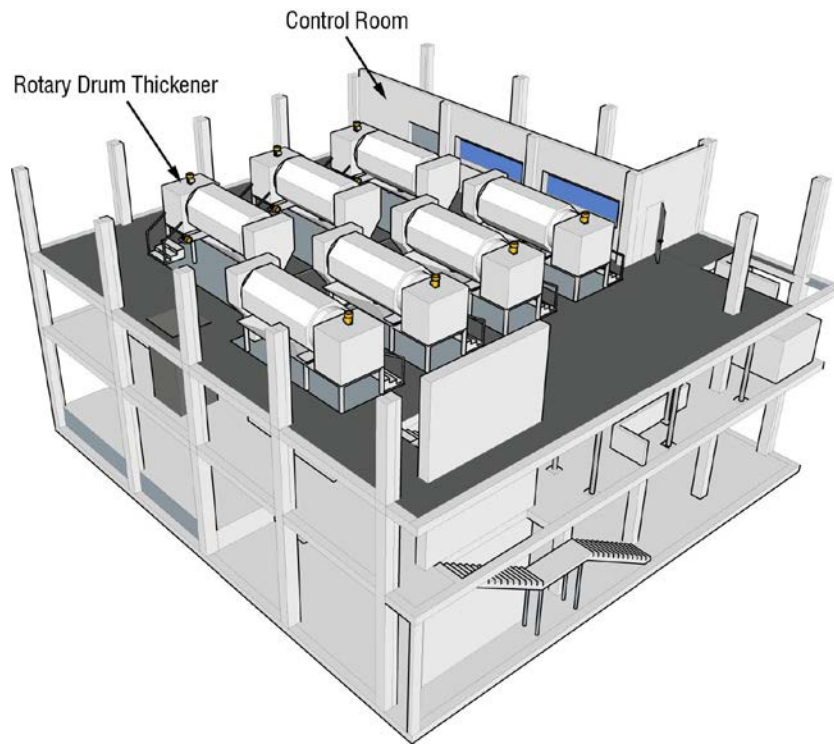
P-3.1.002, RDT Layout in Phase IV Dewatering Building, 2016 Master Plan
